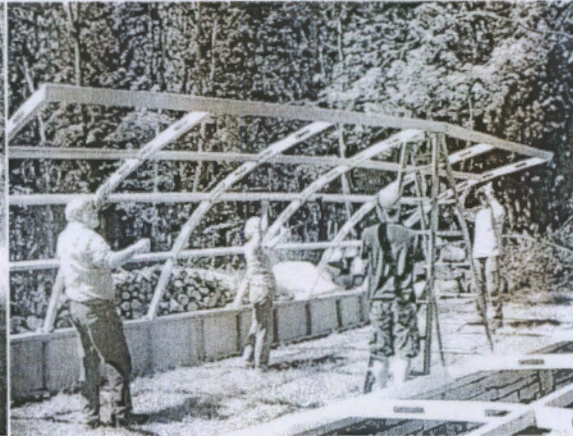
Photo showing knee wall framing on similar greenhouse in Chatham, NY
